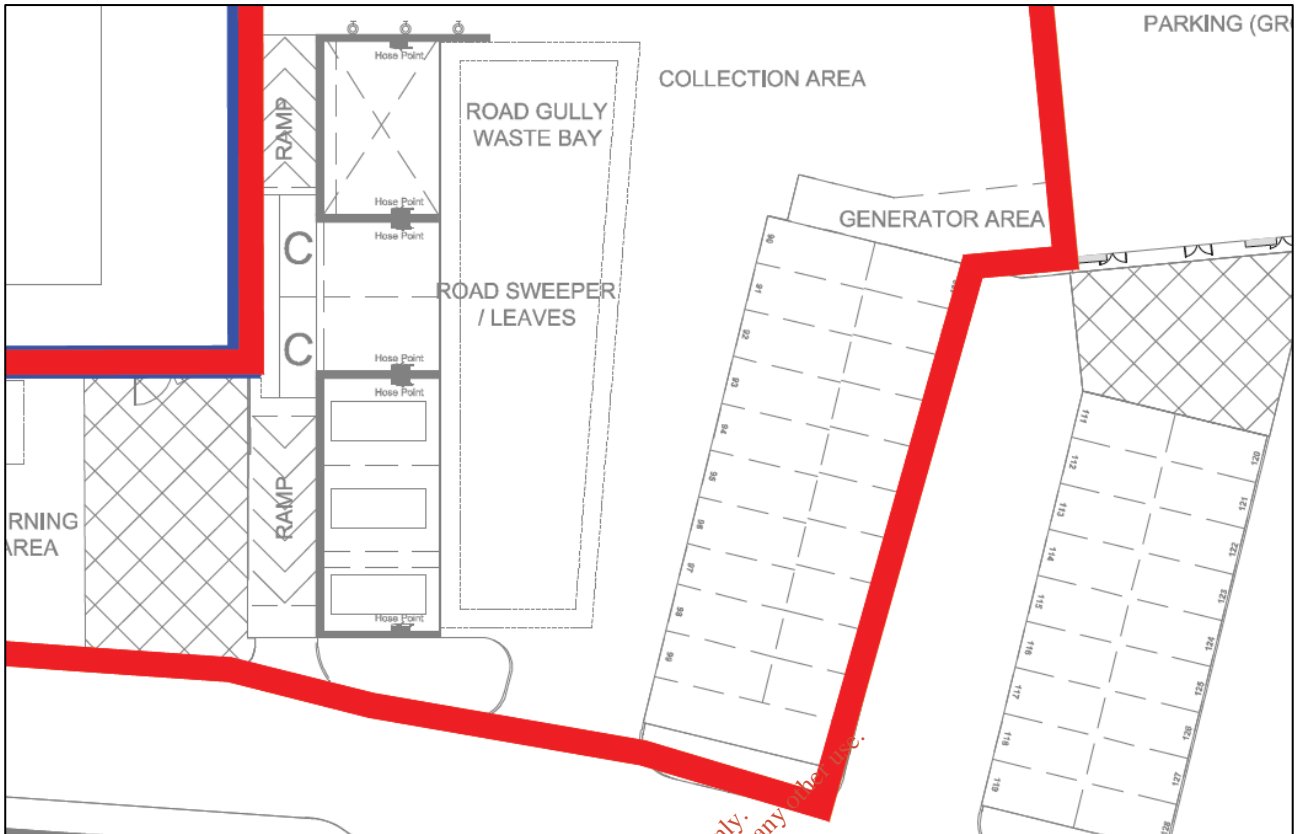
Road Sweeping and Gully Cleaning Equipment Waste Management Area (extracted from Site Plan)
